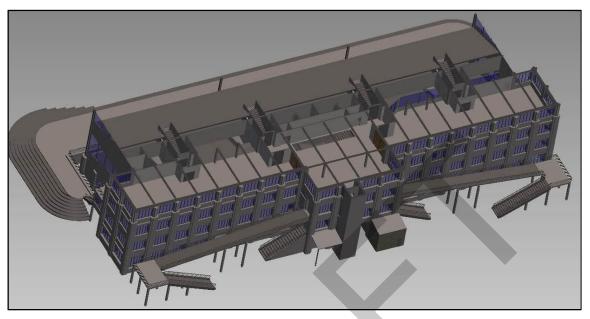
Cutaway showing beams, walls, and columns at the third floor level at GNS
